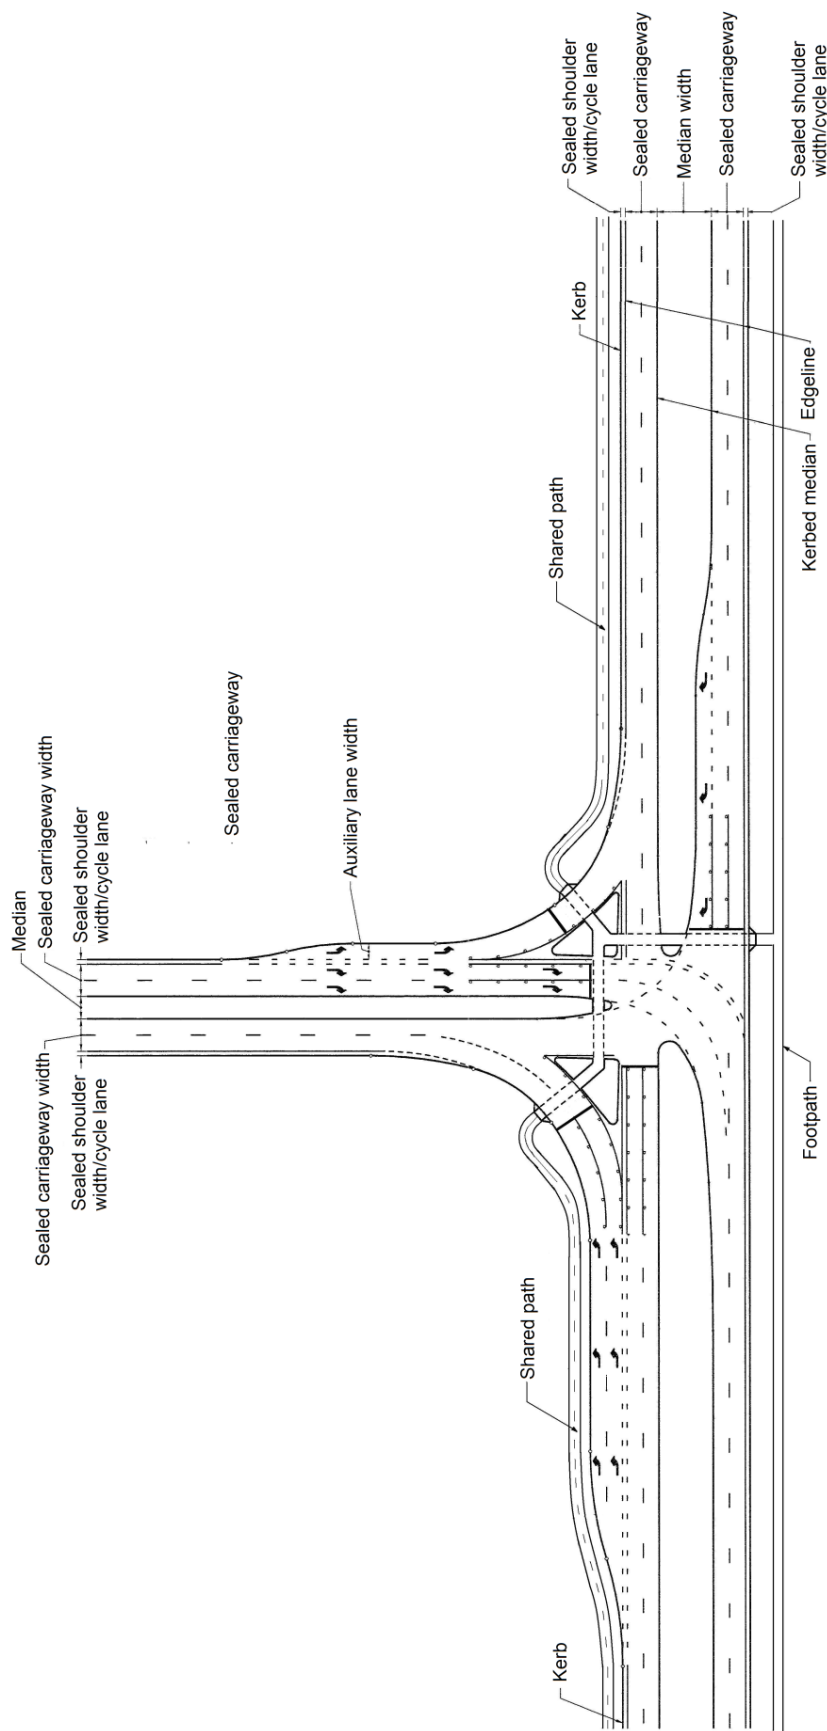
is an example of a signalised intersection and shows the type of detail provided on a signal layout plan that would be prepared, to assist in the specification and installation of traffic signals. Lane arrangements vary depending on the space available on the intersection approaches, the movements to be accommodated or permitted and the volume of traffic (e.g. double right-turn and double left-turn lanes).
